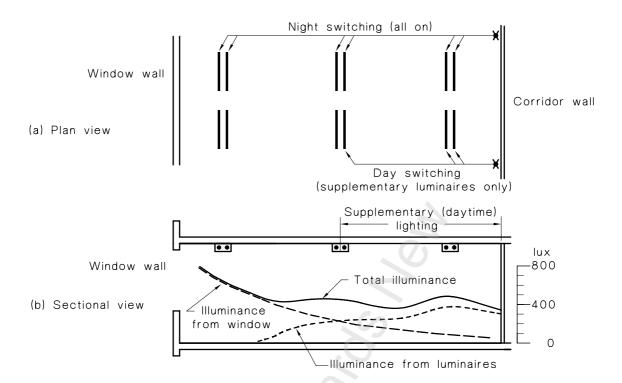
THE INTEGRATION OF DAYLIGHT AND ELECTRIC LIGHT IN A SIDE-LIT ROOM USING SWITCHING
